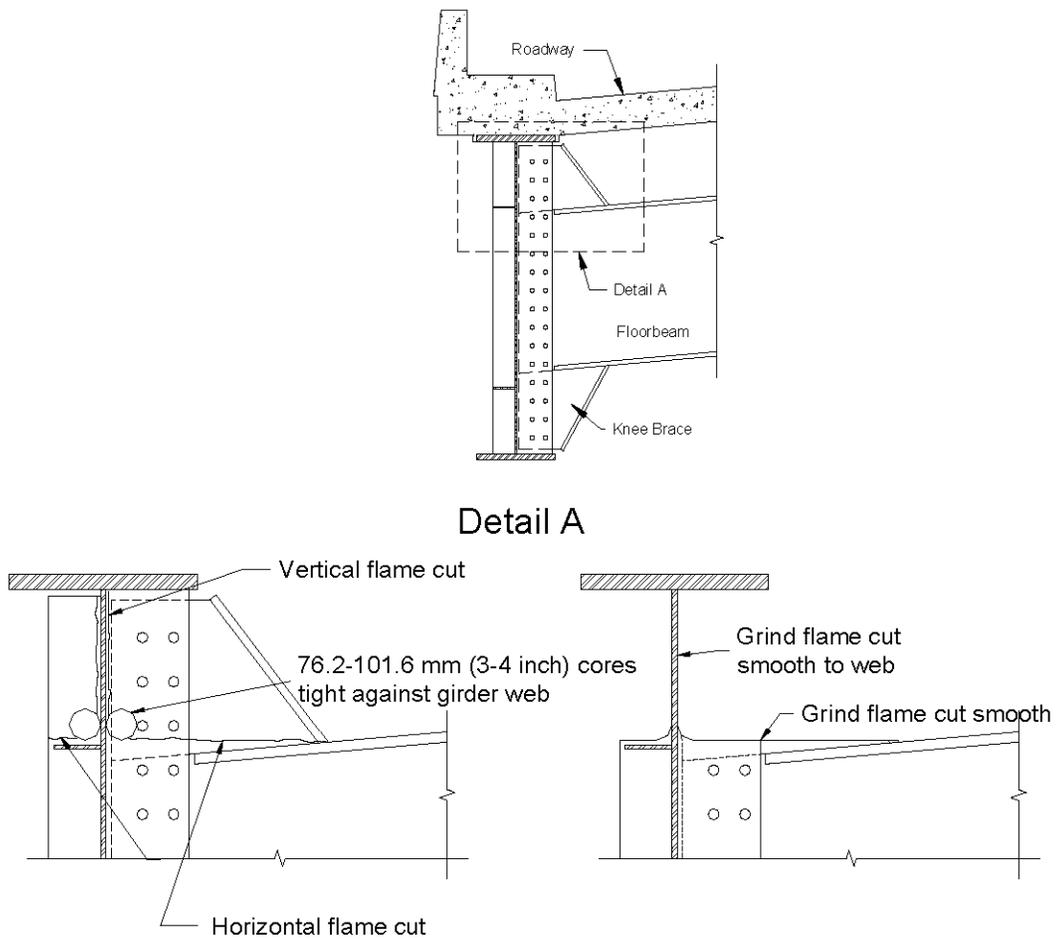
Work plan for web-gap softening used on Poplar Street Bridges in East St. (Koob et al. 1998)
